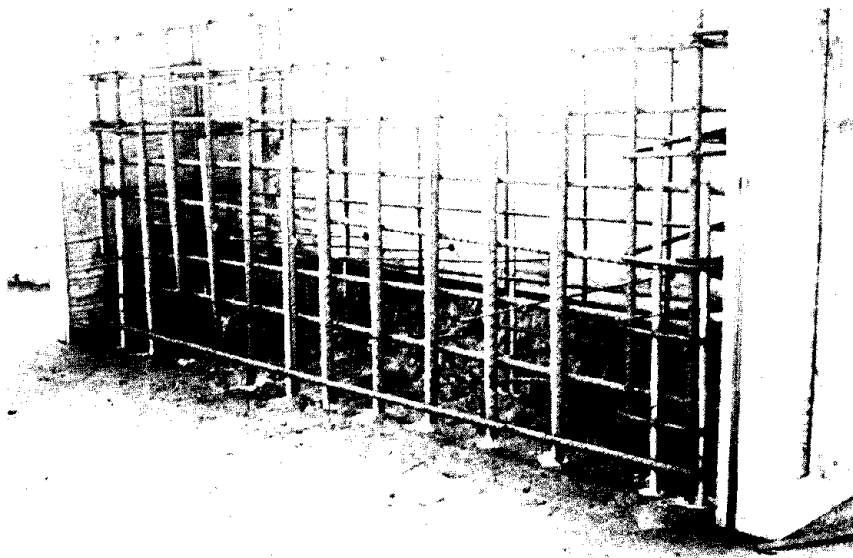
Construction of backwall at a location with an existing concrete pad.
